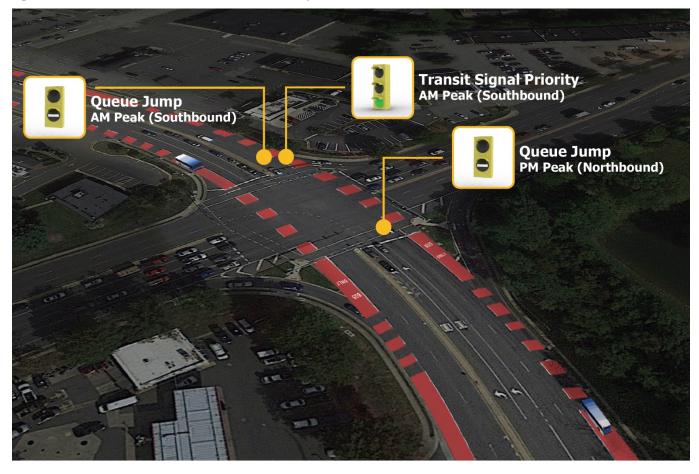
Dale Boulevard at Minnieville Road Potential Layout
